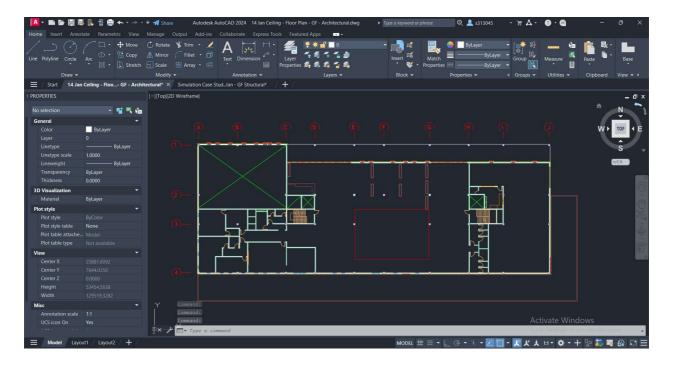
Ground floor plan in AutoCAD before applying changes, Elaborated by Authors
